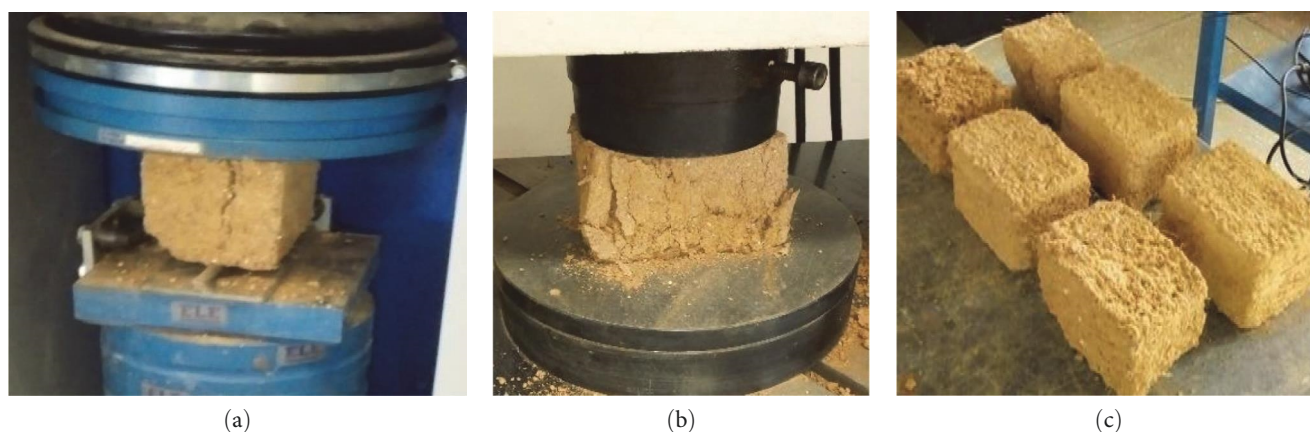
Testing of brick specimen: (a) splitting tensile strength test, (b) compressive strength test, and (c) brick specimens after abrasion test.
